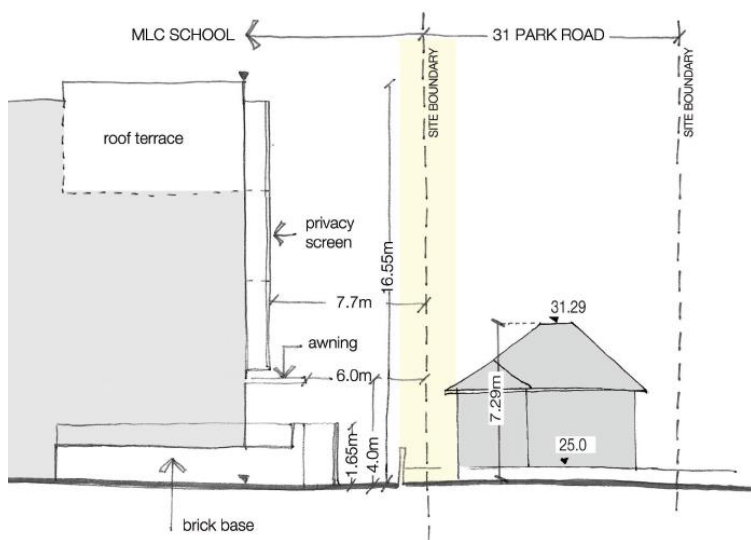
Proposed roof terrace and separation distances to adjoining dwellings
